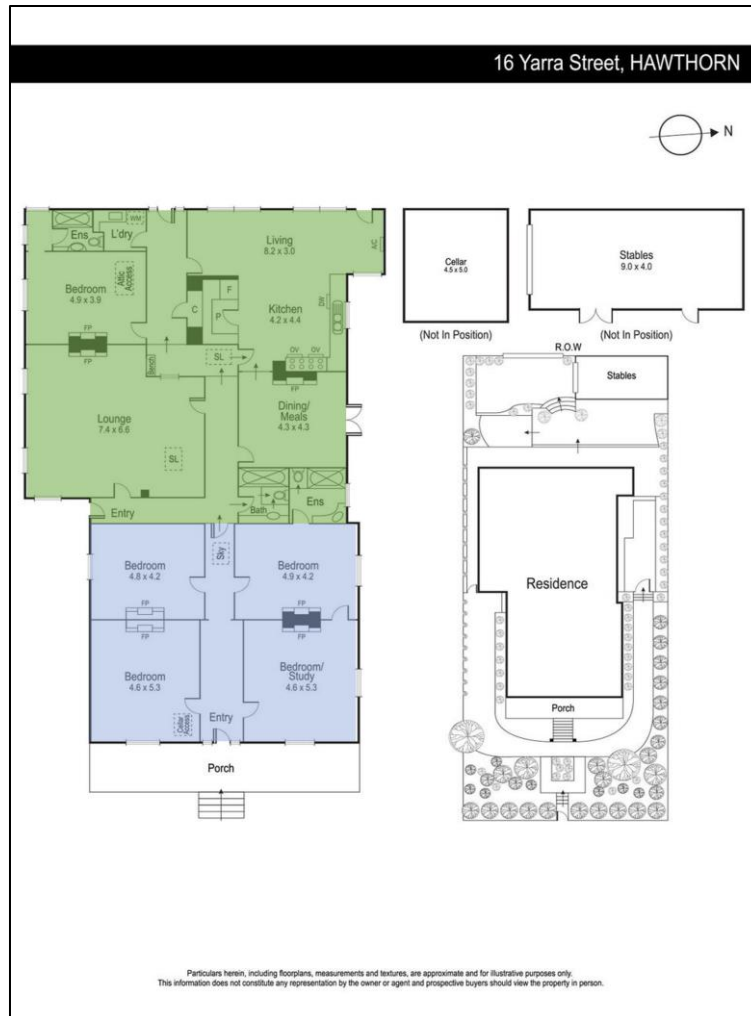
Floor plan of the Place with coloured shading to delineate the two permit exemptions relevant to the interior of the residence. Green indicates a permit exemption for all structural and non-structural internal works, blue indicates a permit exemption for all non-structural internal works. Image reproduced with permission from Kay and Burton, Hawthorn, available at <https://www.realestate.com.au/sold/property-house-vic-hawthorn-130958986>
